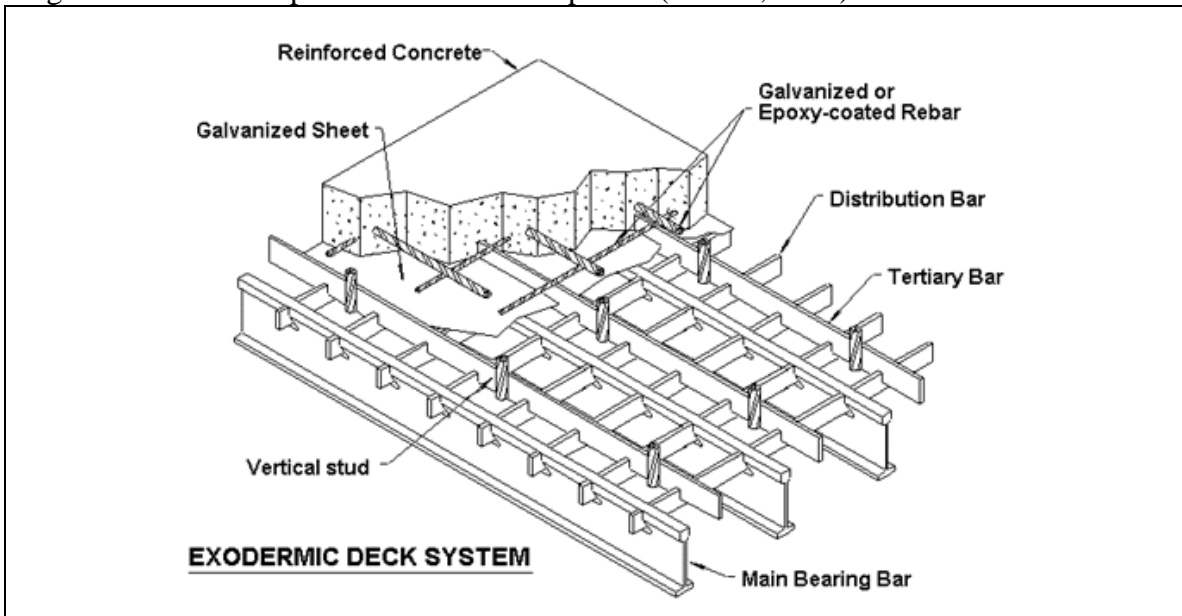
Exodermic Deck System original design (Exodermic Bridge Deck, Inc., 1998)
